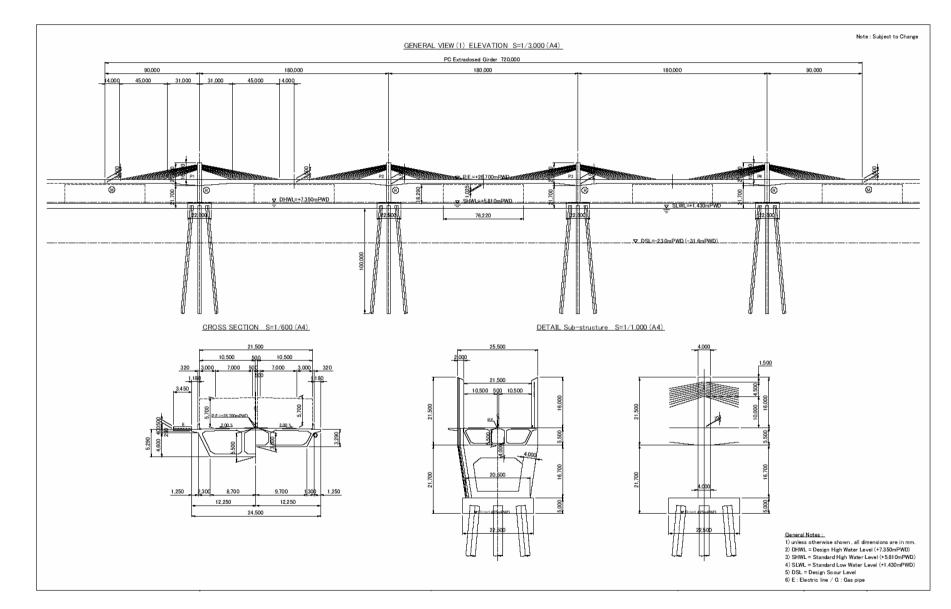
Main Bridge Portion (Alternative-H1, H2)
